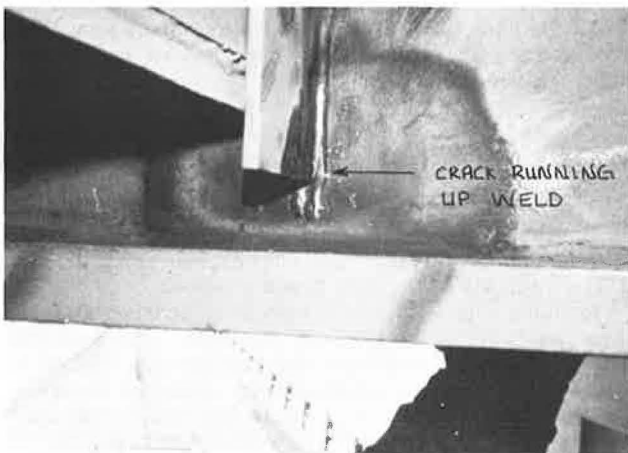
Crack in web-to-flange weld below stiffener.
